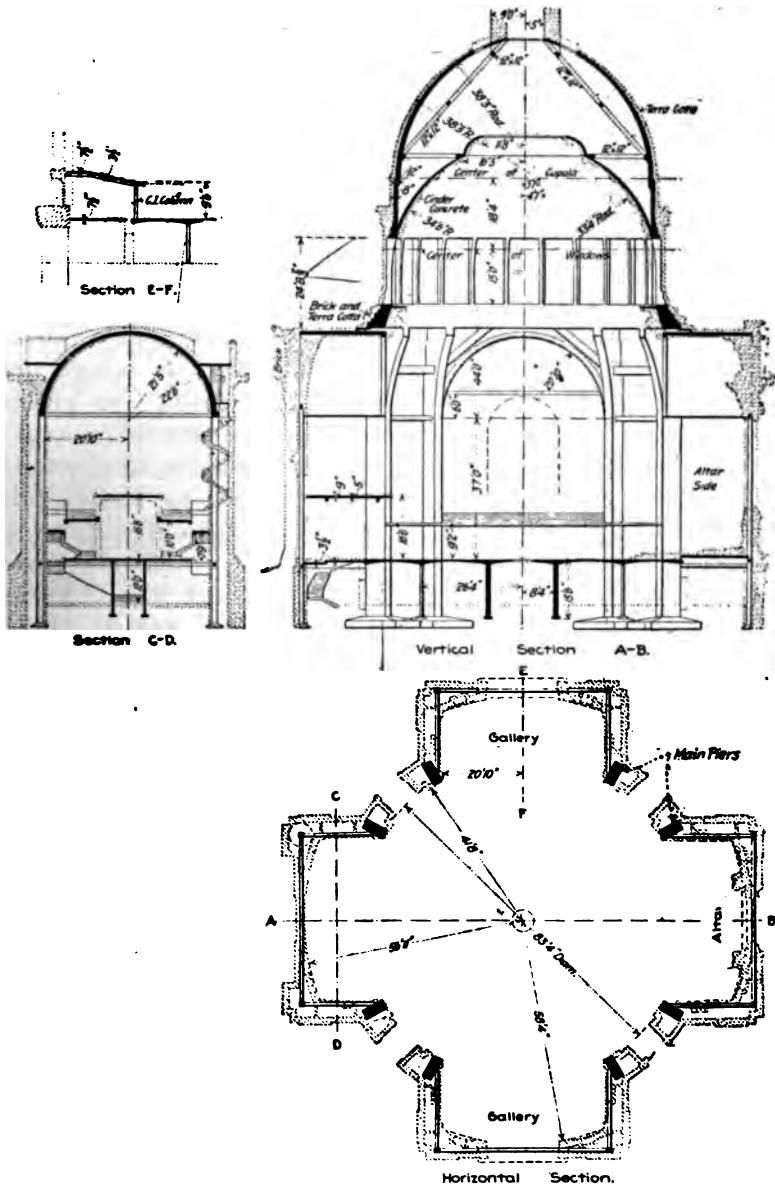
Plan and Sections of Naval Academy Chapel, Annapolis, Md.
